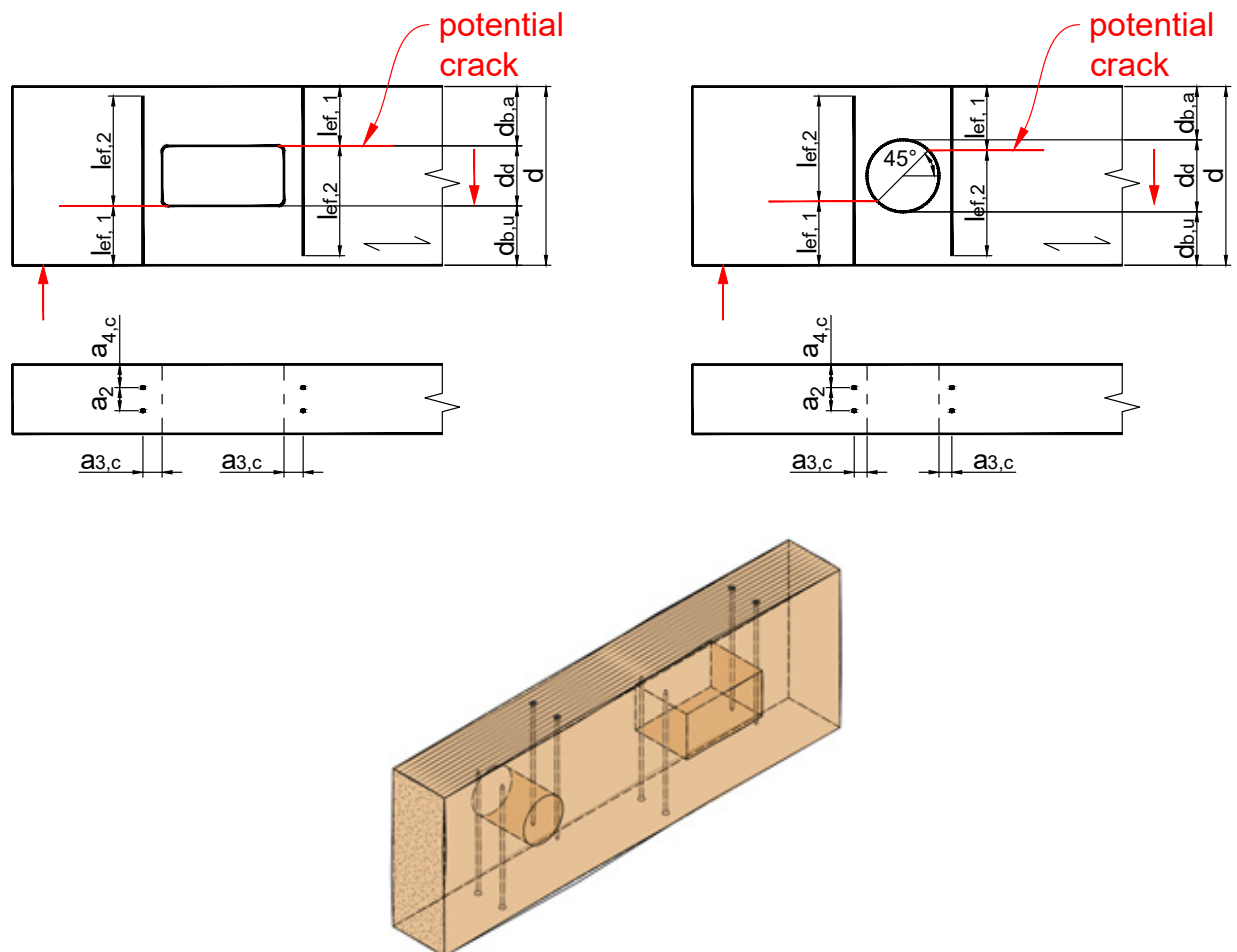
Reinforcement of beams with penetrations with rectangular and round holes reinforced with fully threaded screws or glued-in rods.
